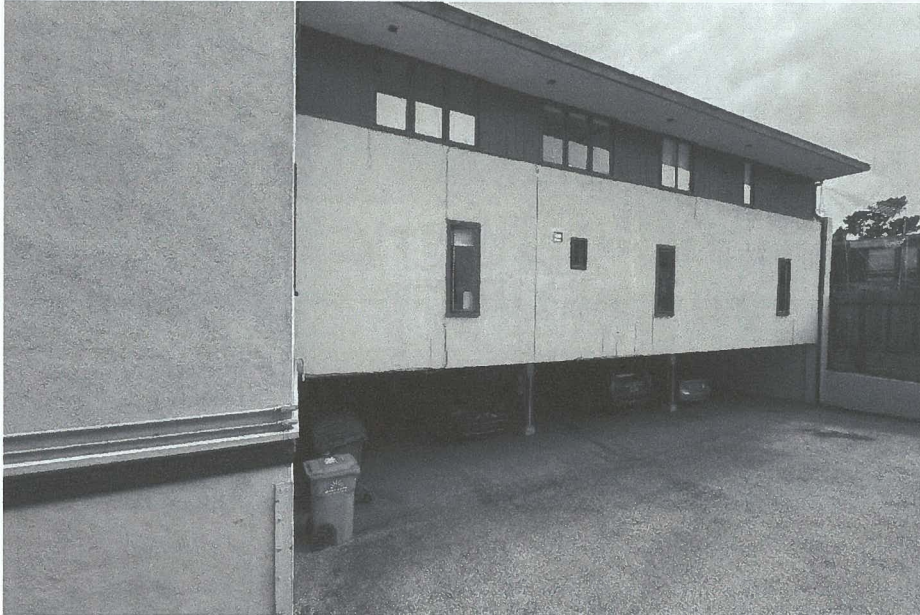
Whole west elevation across parking lot of adjacent property, facing east; wooden shed on right is on adjacent property
